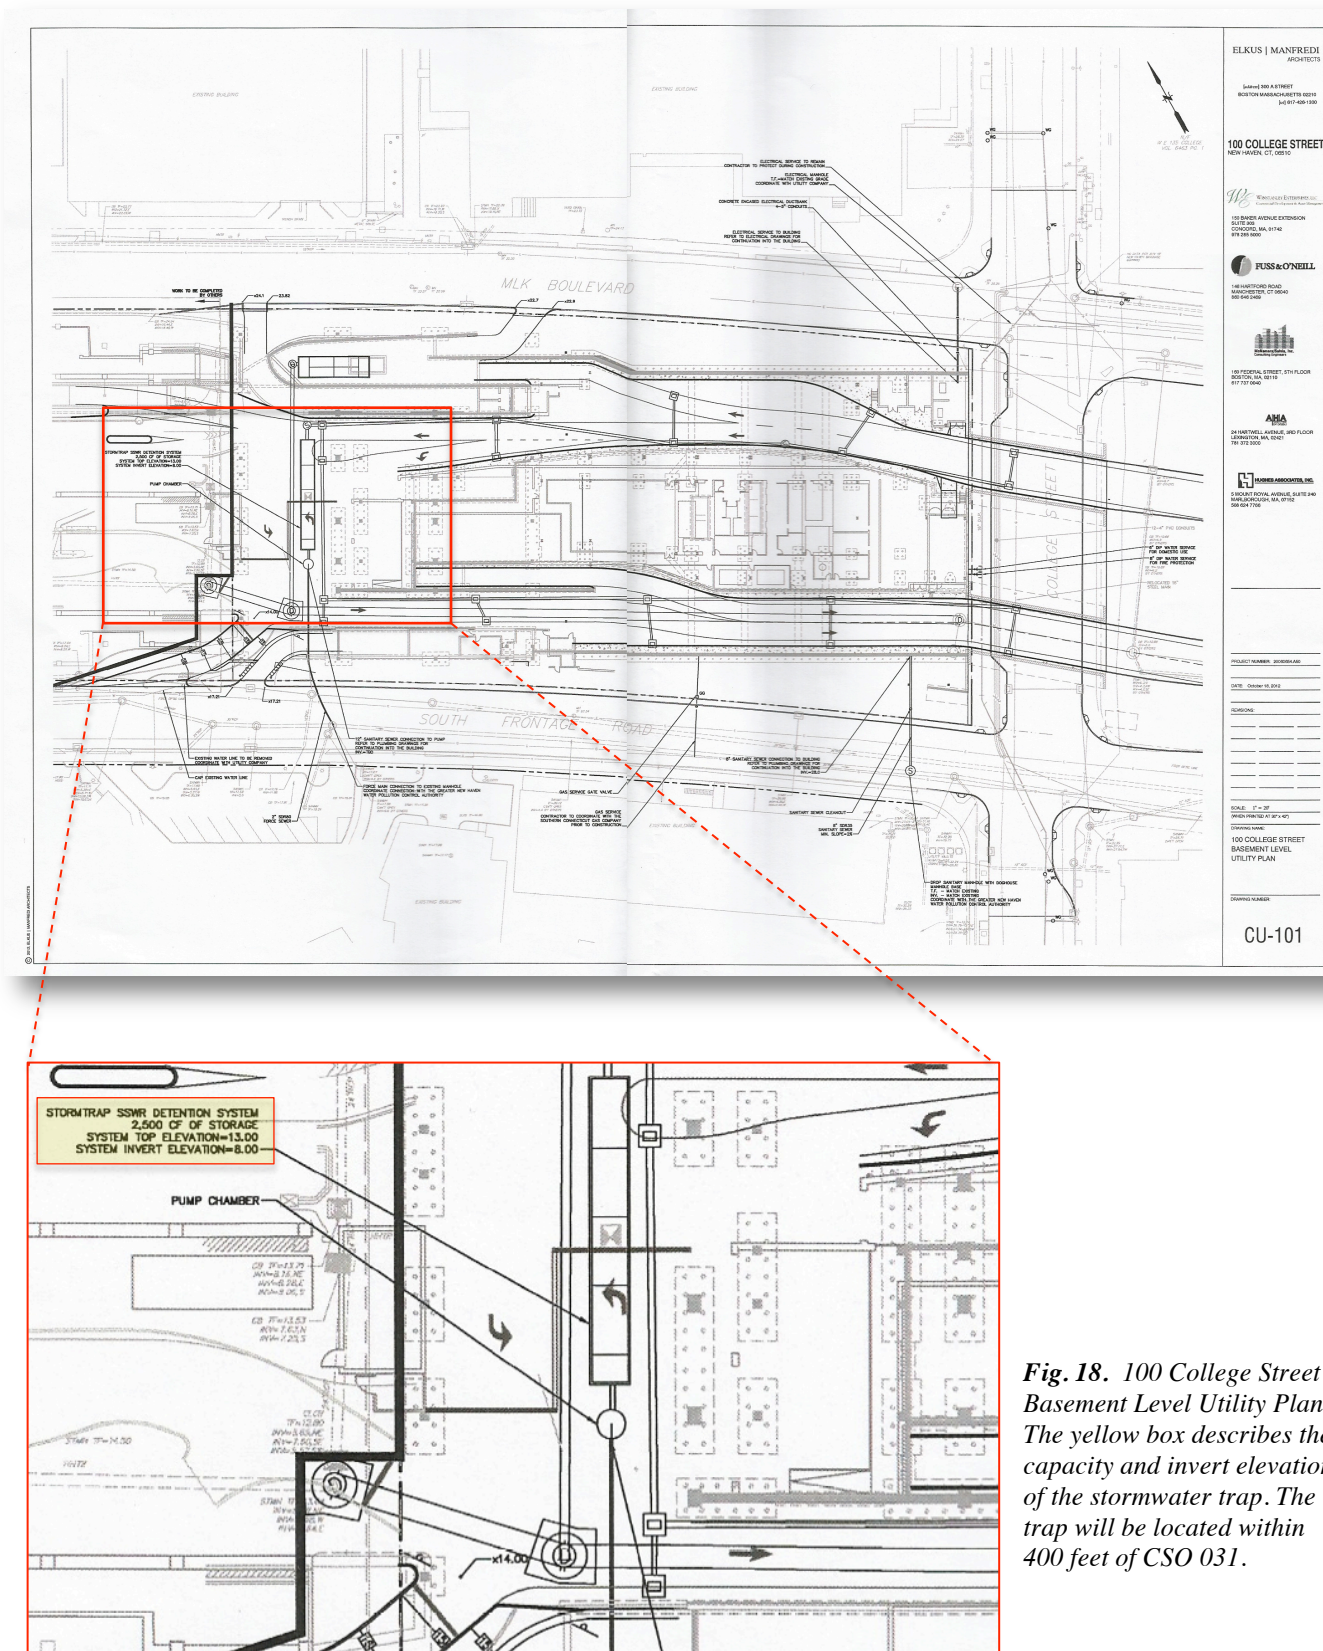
100 College Street – Basement Level Utility Plan. The yellow box describes the capacity and invert elevation of the stormwater trap. The trap will be located within 400 feet of CSO 031.
